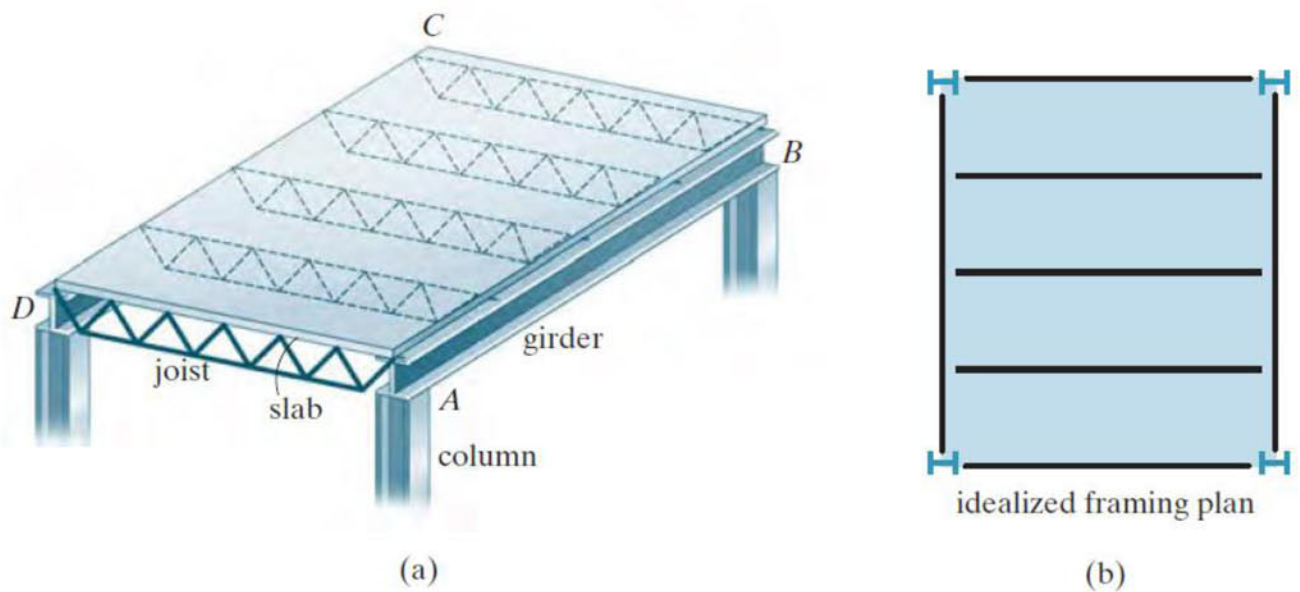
Idealization of a Typical Floor Slab in a Steel Building.
